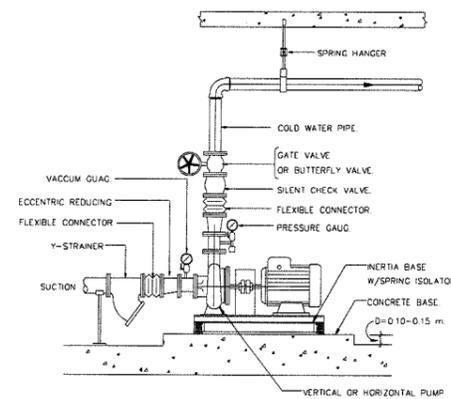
DETAIL OF VERTICAL MULTISTAGE BOOSTER PUMP SET
